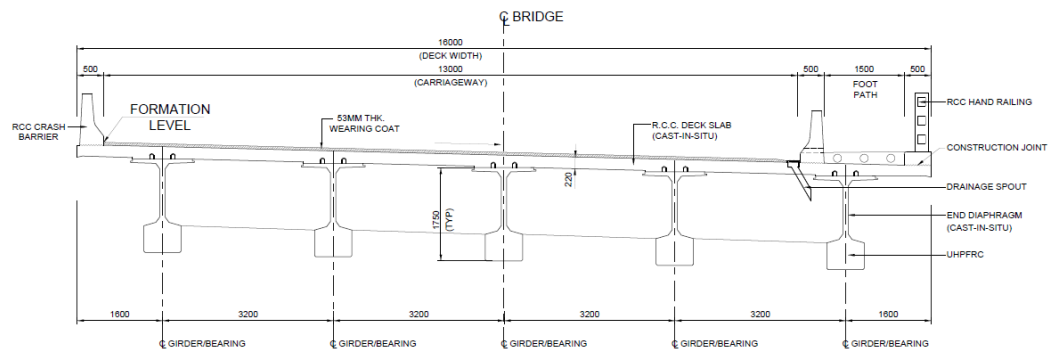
34 Cross section of 40m span UHPFRC post tensioned I girder at support
